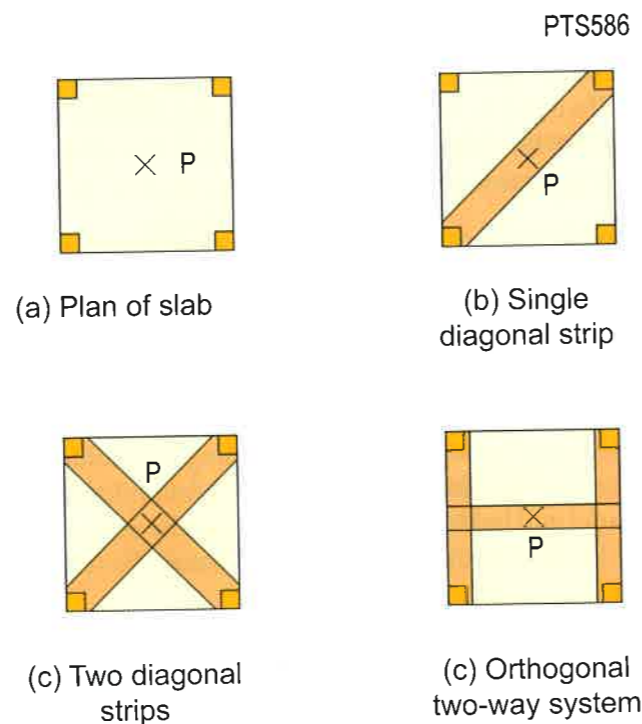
Plan of a Column-Supported Single Panel; Load Path Options for Strength Design
